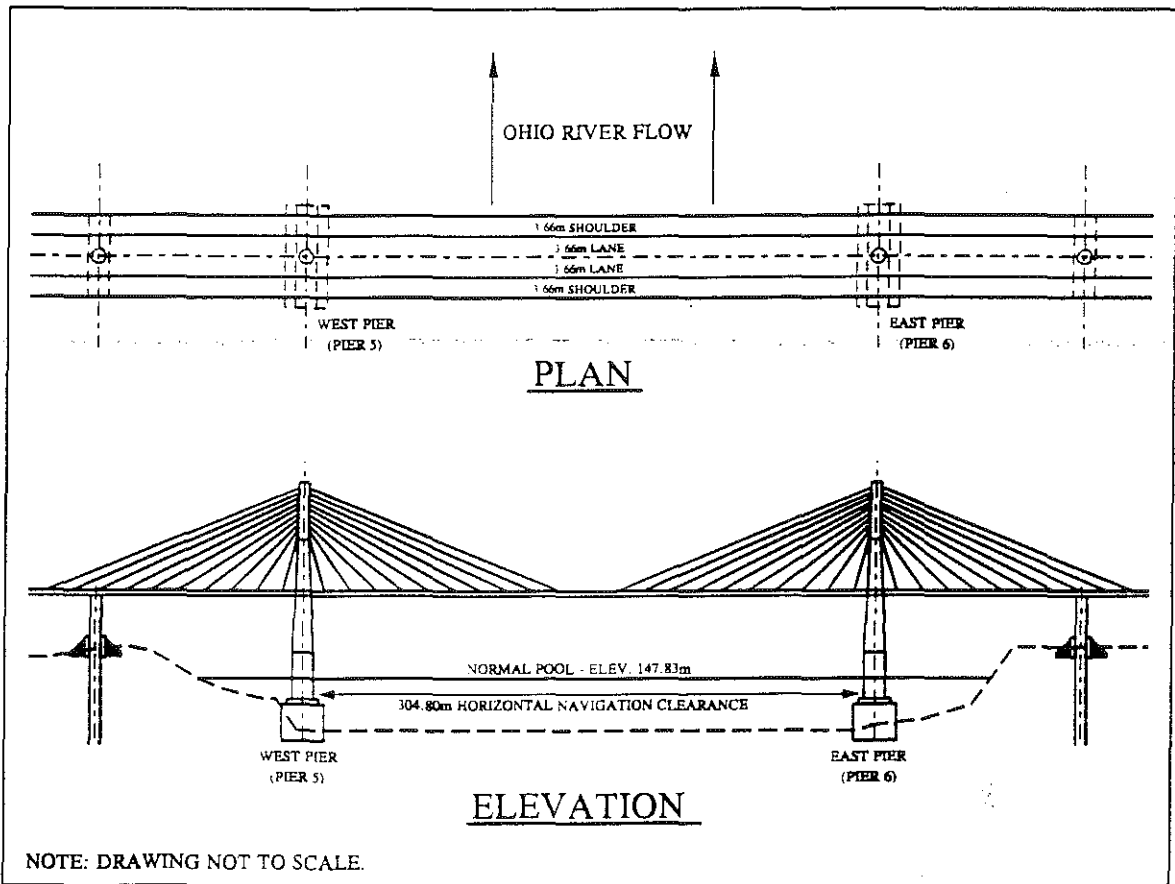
Plan and Elevation Views of the Cable Suspended Bridge Over the Ohio River at Maysville, KY.
